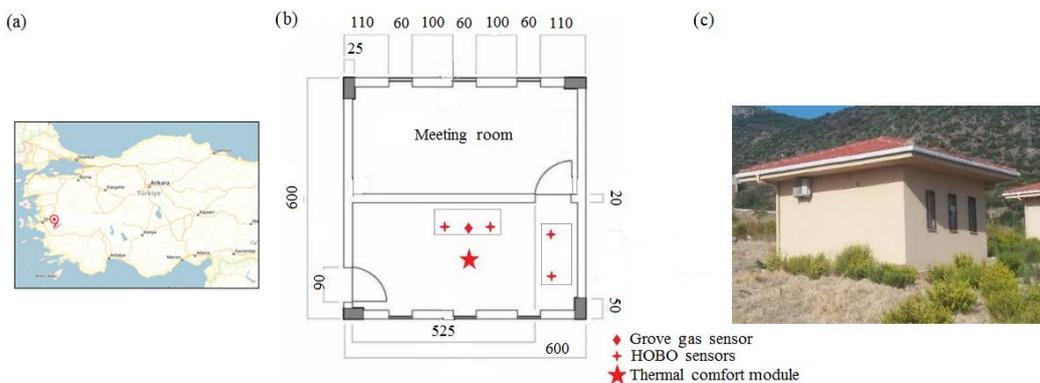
The case building; (a) location, (b) plan, and (c) outer view
